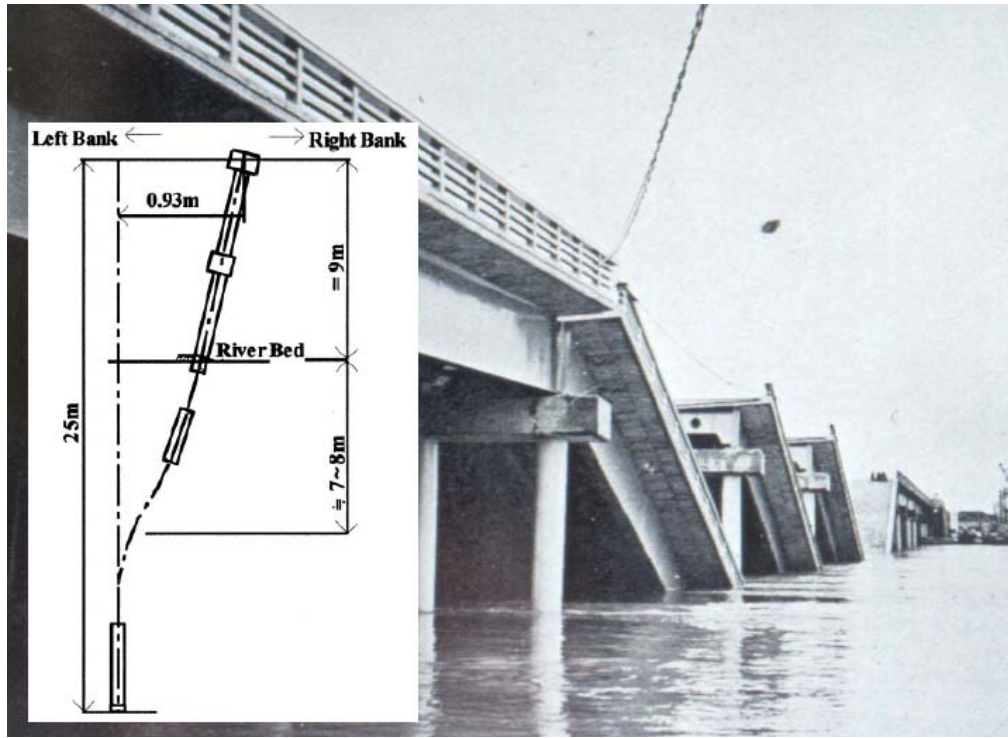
Damage to steel piles of Showa Bridge (From Yasuda and Berill, 2000)
